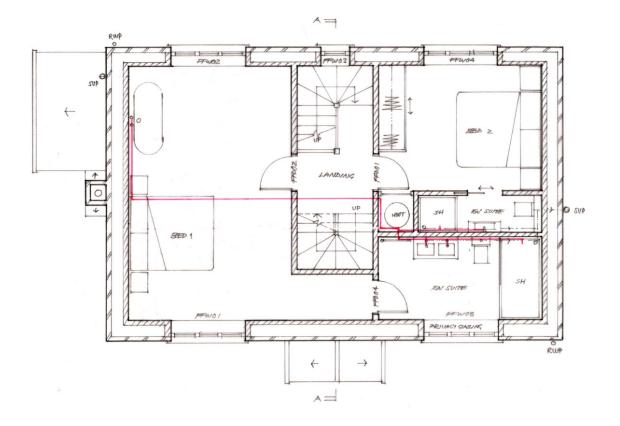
First Floor Plan. Drawing by Lacey Interior Architecture Ltd.
